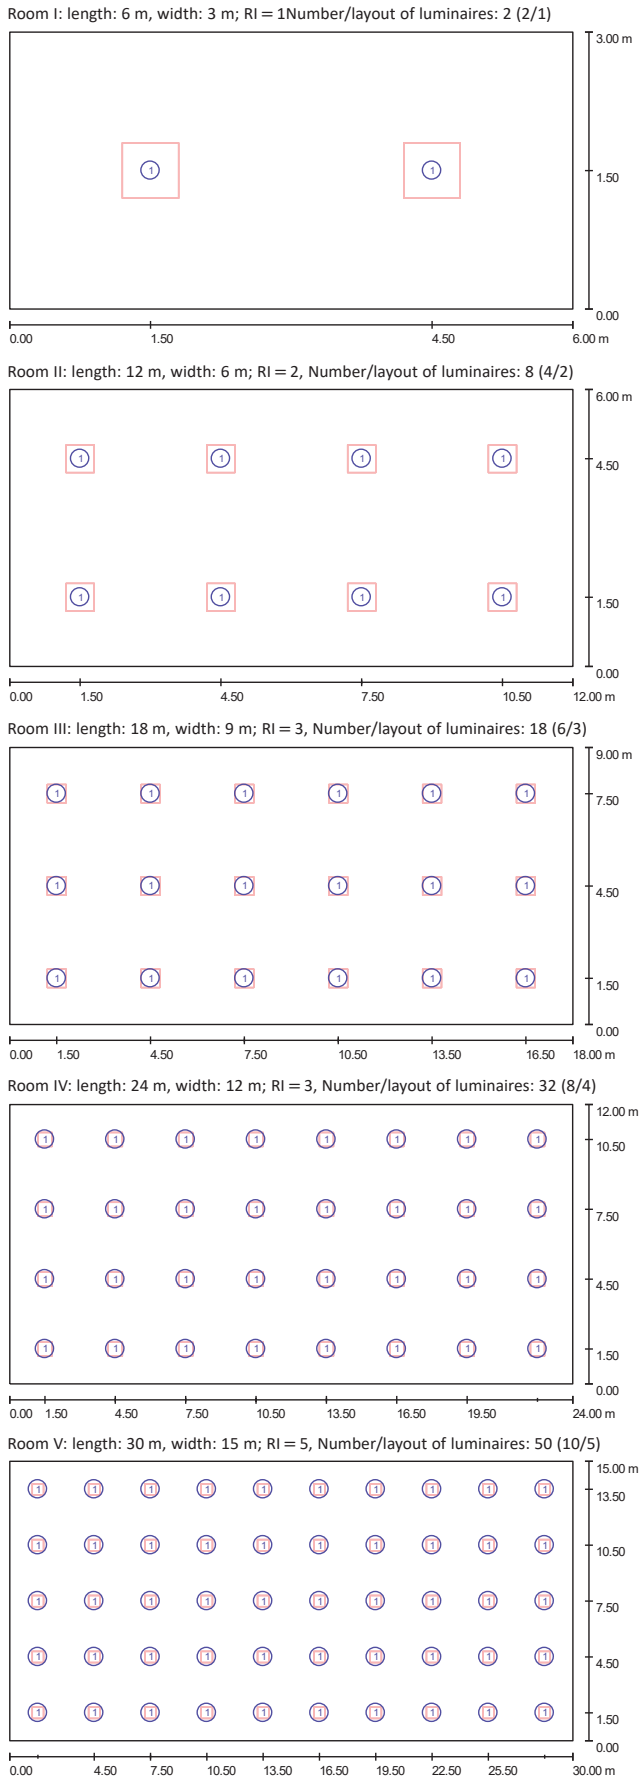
Floor view of the rooms and luminaire layouts for the study
